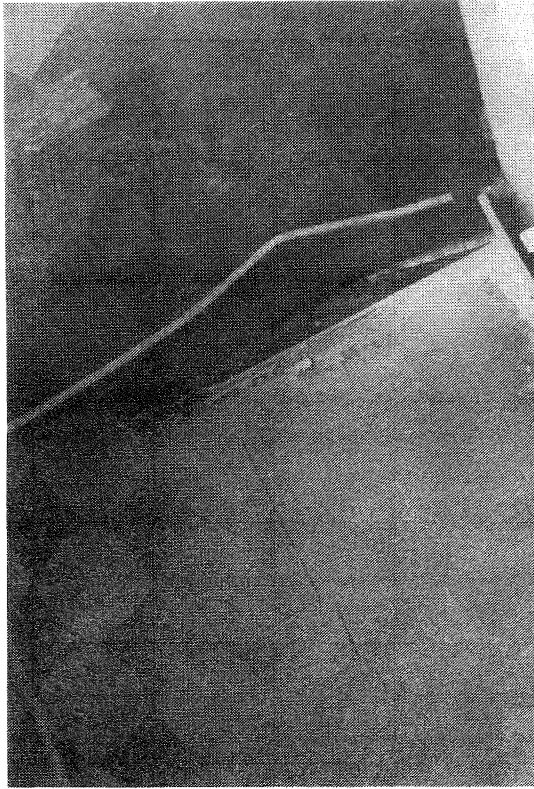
Lack of fusion in fillet weld to a diaphragm plate in the steel box columns—Pino Suarez Tower, collapsed 20 storeys.
